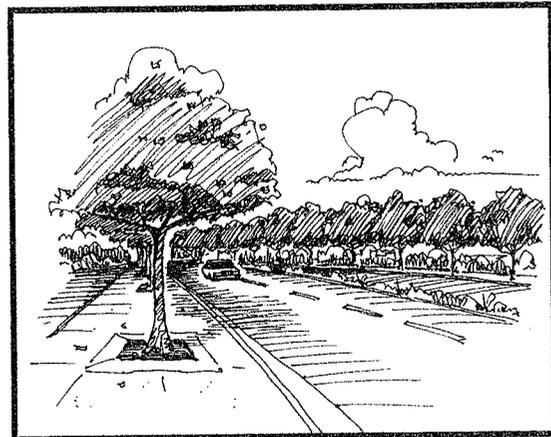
Proposed view of "Route to Downtown" with tree-lined roadway.
